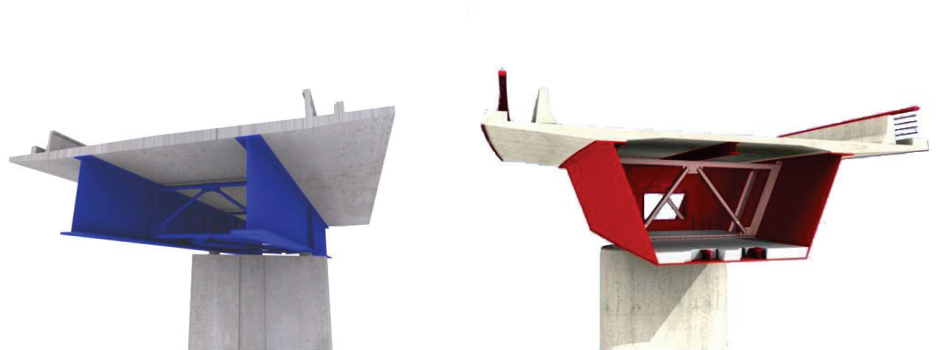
Twin girder and Box girder bridges (© GRID 2008)
